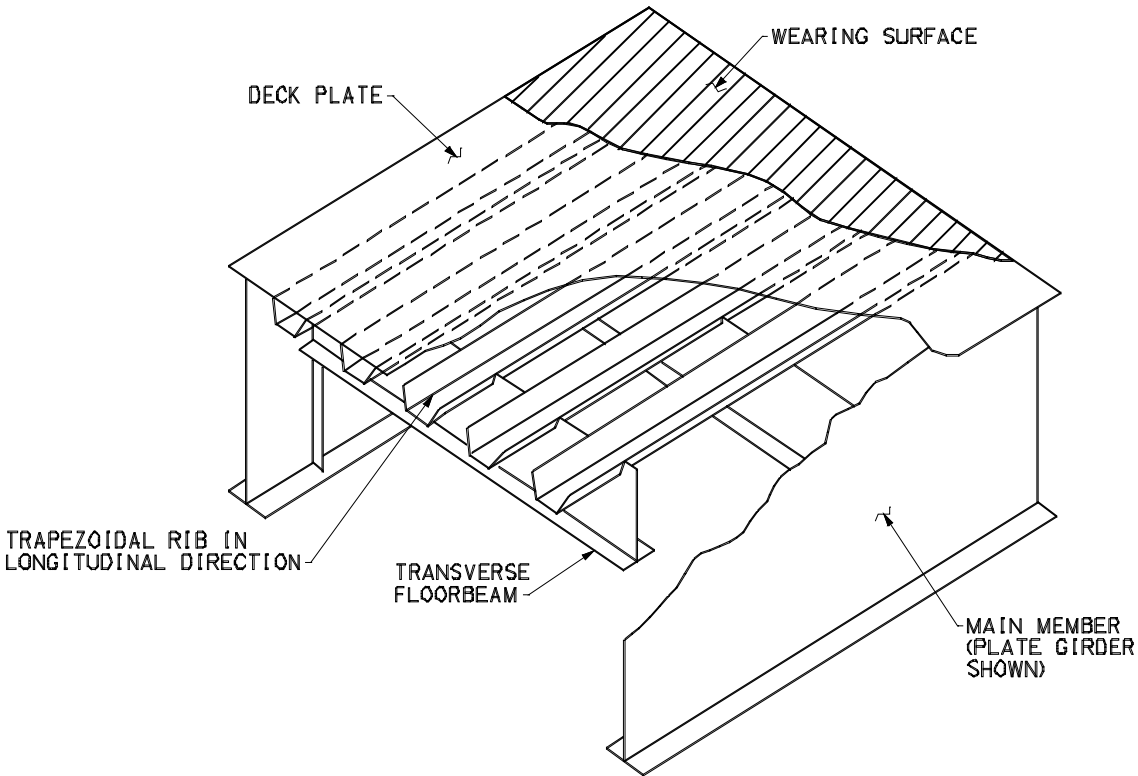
Closed rib orthotropic bridge deck system featuring trapezoidal shaped ribs
